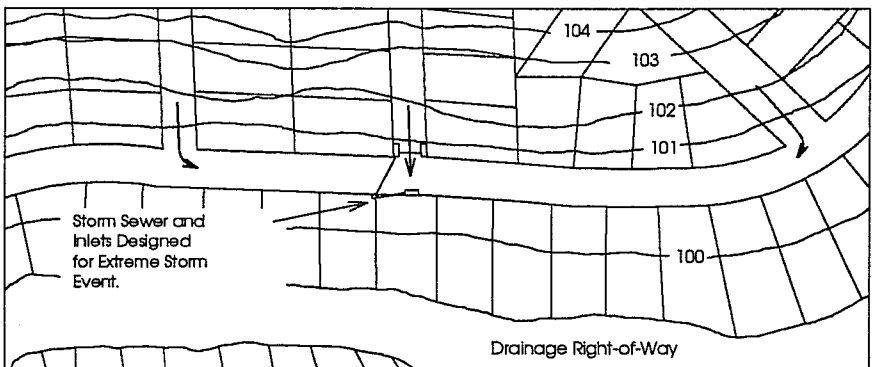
illustrates a situation in which many streets intersect a single street which is lower than the intersecting streets so that sheet flow down the streets can escape only through existing building lots. Figure 4.10 illustrates an acceptable alternative.
